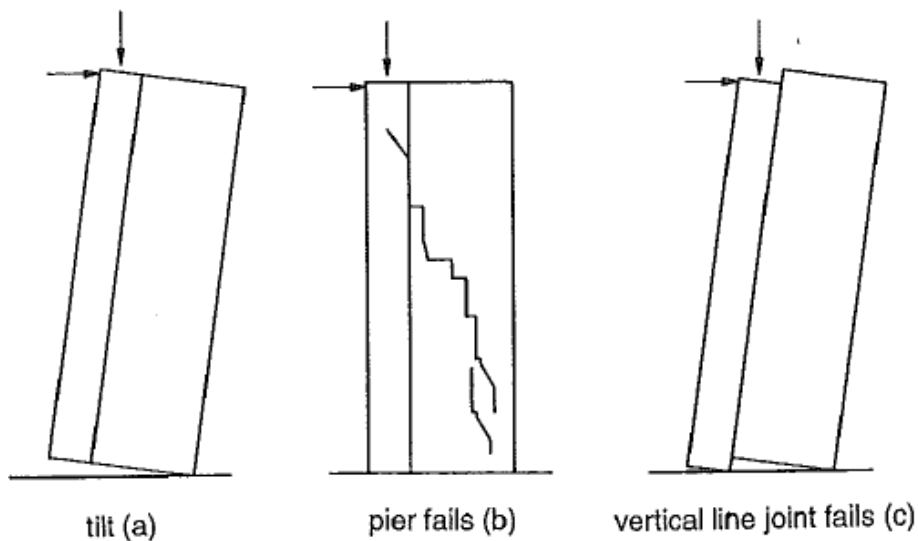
Failure modes of masonry wall-pier connections; (a) tilting of the entire structure; (b) failure of the piers; (c) failure of the vertical line joint (Rots 1997)
